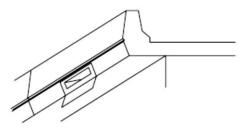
Example of a Horizontal Bridge Scupper through a Bridge Parapet (Courtesy of the Maryland DOT)
